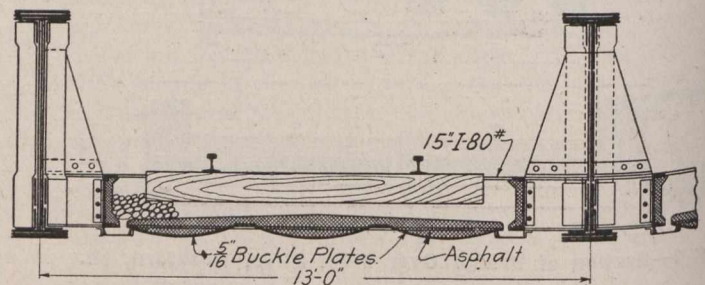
Shallow Ballasted Floor Bridge in Highland Park, Ill.
